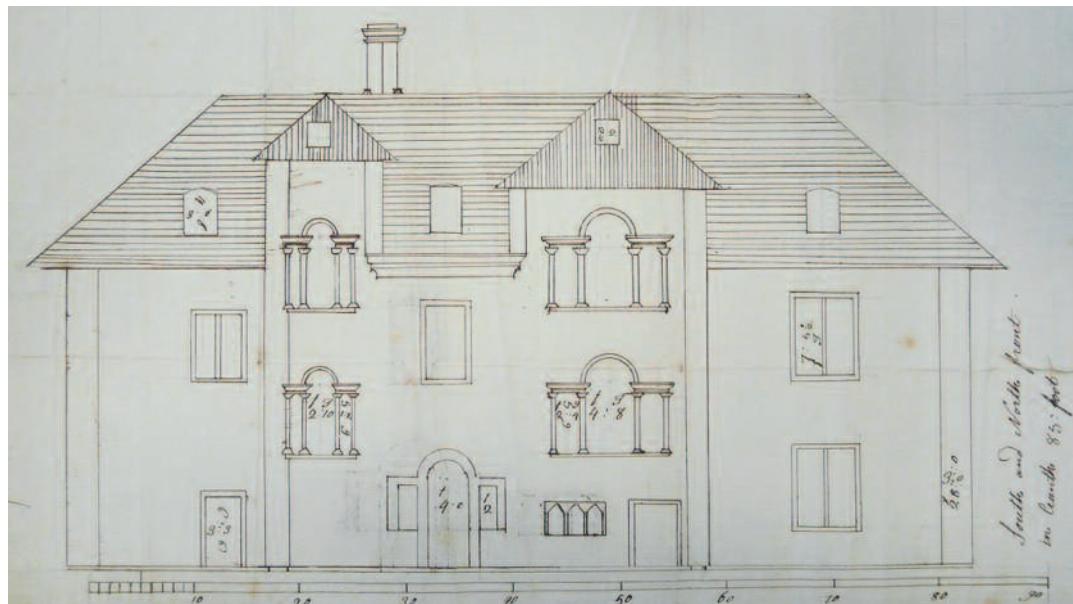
Capheaton Hall: north elevation, complementary to the plan illustrated at Fig. 6
